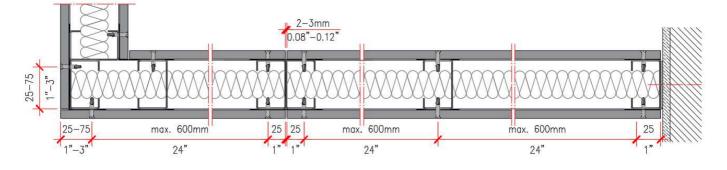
Horizontal section of the wall, galvanized steel structure
